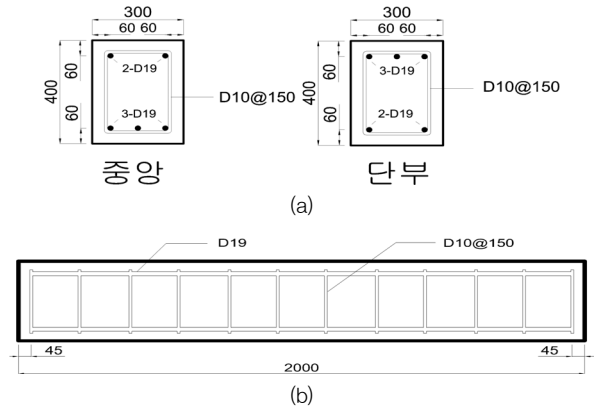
(a) Section of Specimens (b) Details of Specimens
